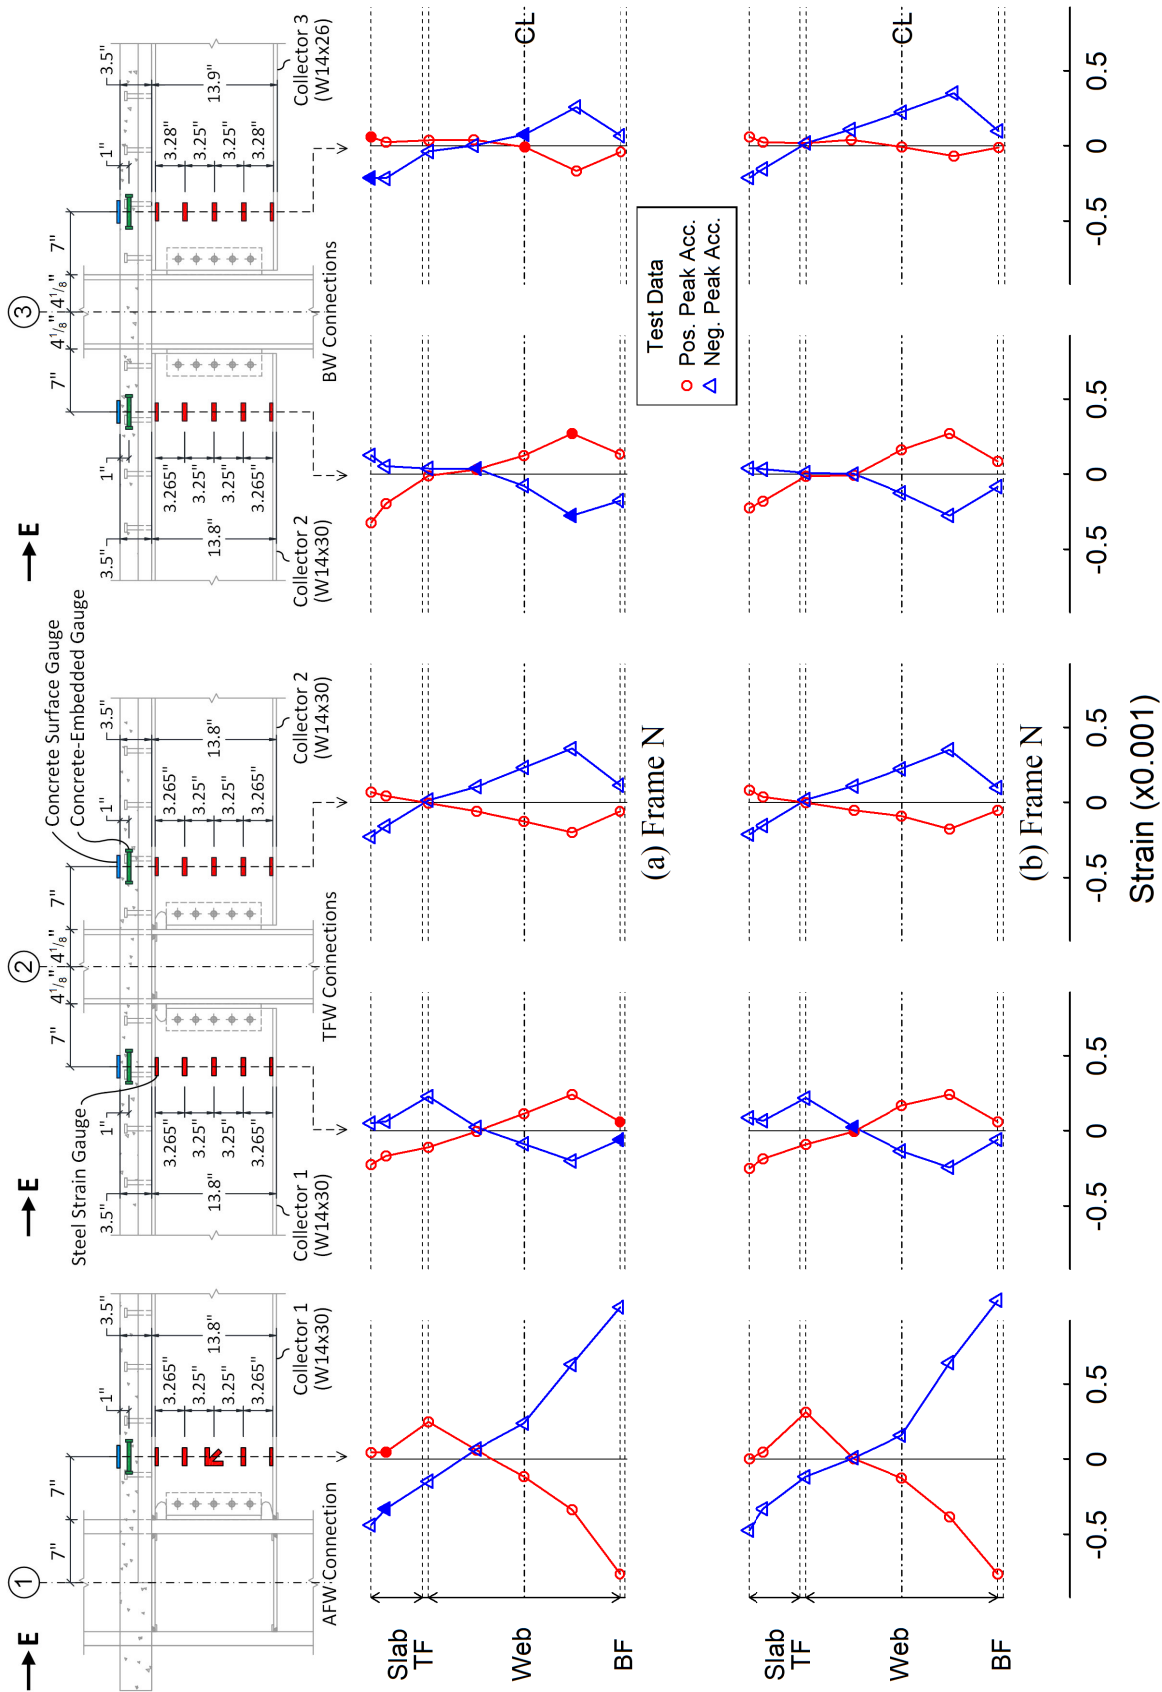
Test 1-3: Strain Profiles near Collector-to-Column Connections (2<sup>nd</sup> Floor)
